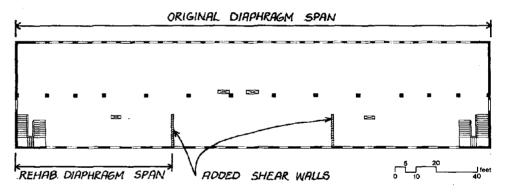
Addition of shear walls to decrease span of diaphragm, Veihmeyer Hall, University of California at Davis.
